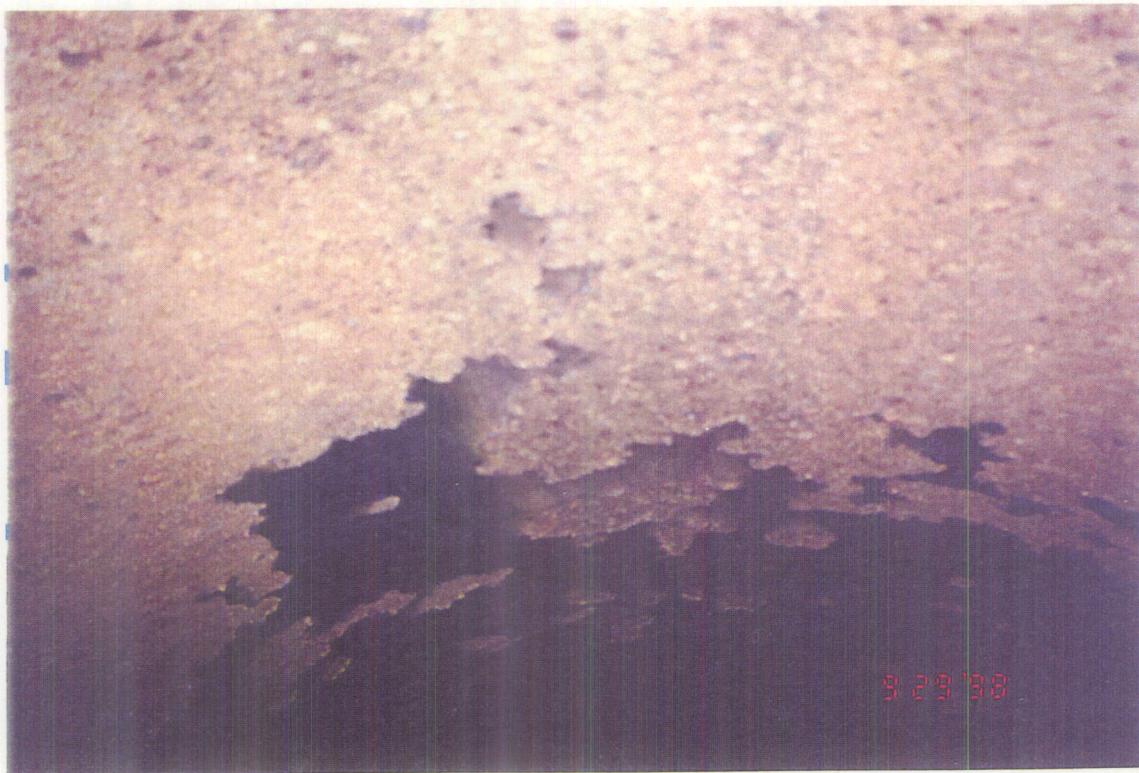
Morris Dam - Butterfly Valve 1A - View of corrosion on pipe immediately downstream of disc seat.
